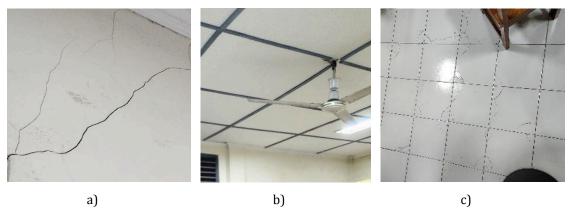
a) Cracked wall, b) Fan not properly attached, c) Cracked floor
